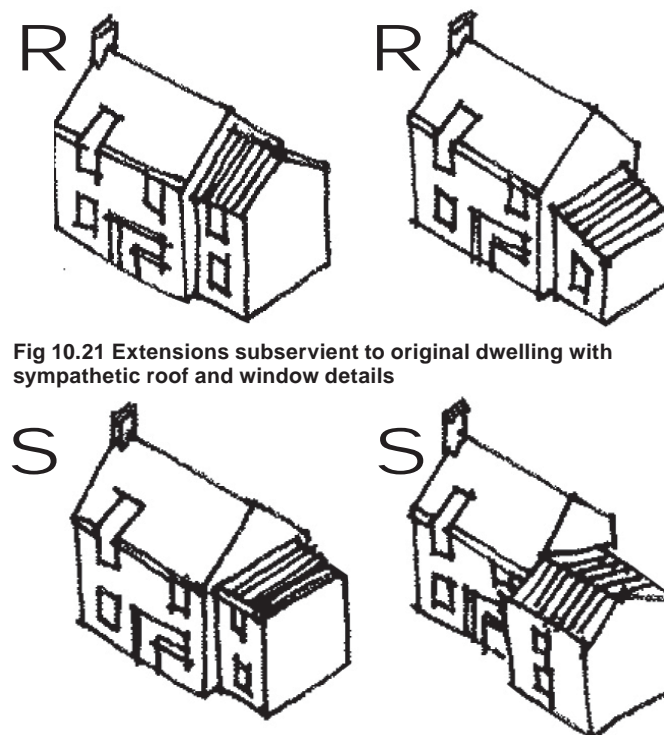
Extensions subservient to original dwelling with sympathetic roof and window details
